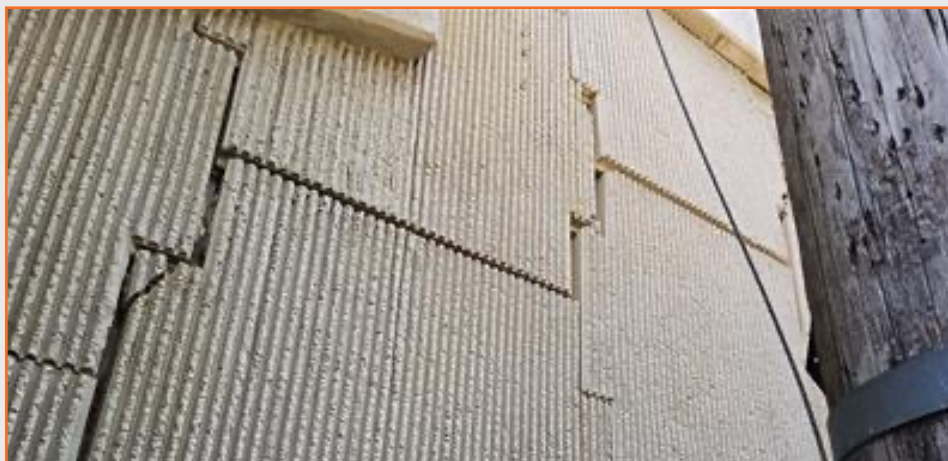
DNT MSE wall with racked panels exhibiting cracking and spalling SBML south of IH-635.
